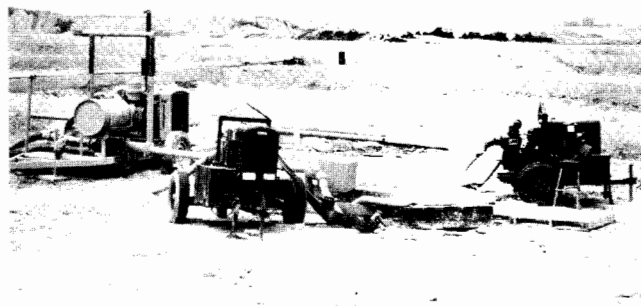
Flash mixer with circulating pumps. Bentonite slurry holding pond in background.
